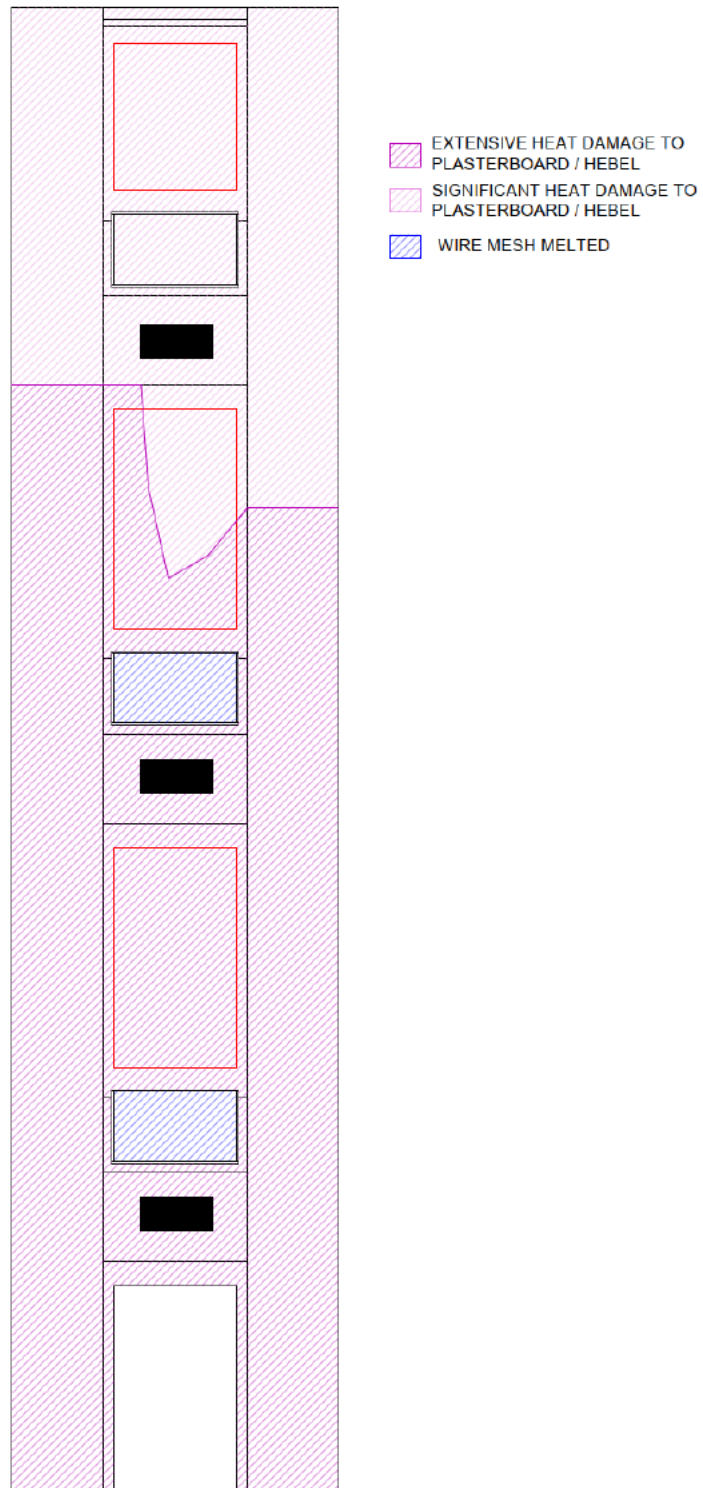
The external wall system – 22 minutes and 12 seconds after crib was extinguished
